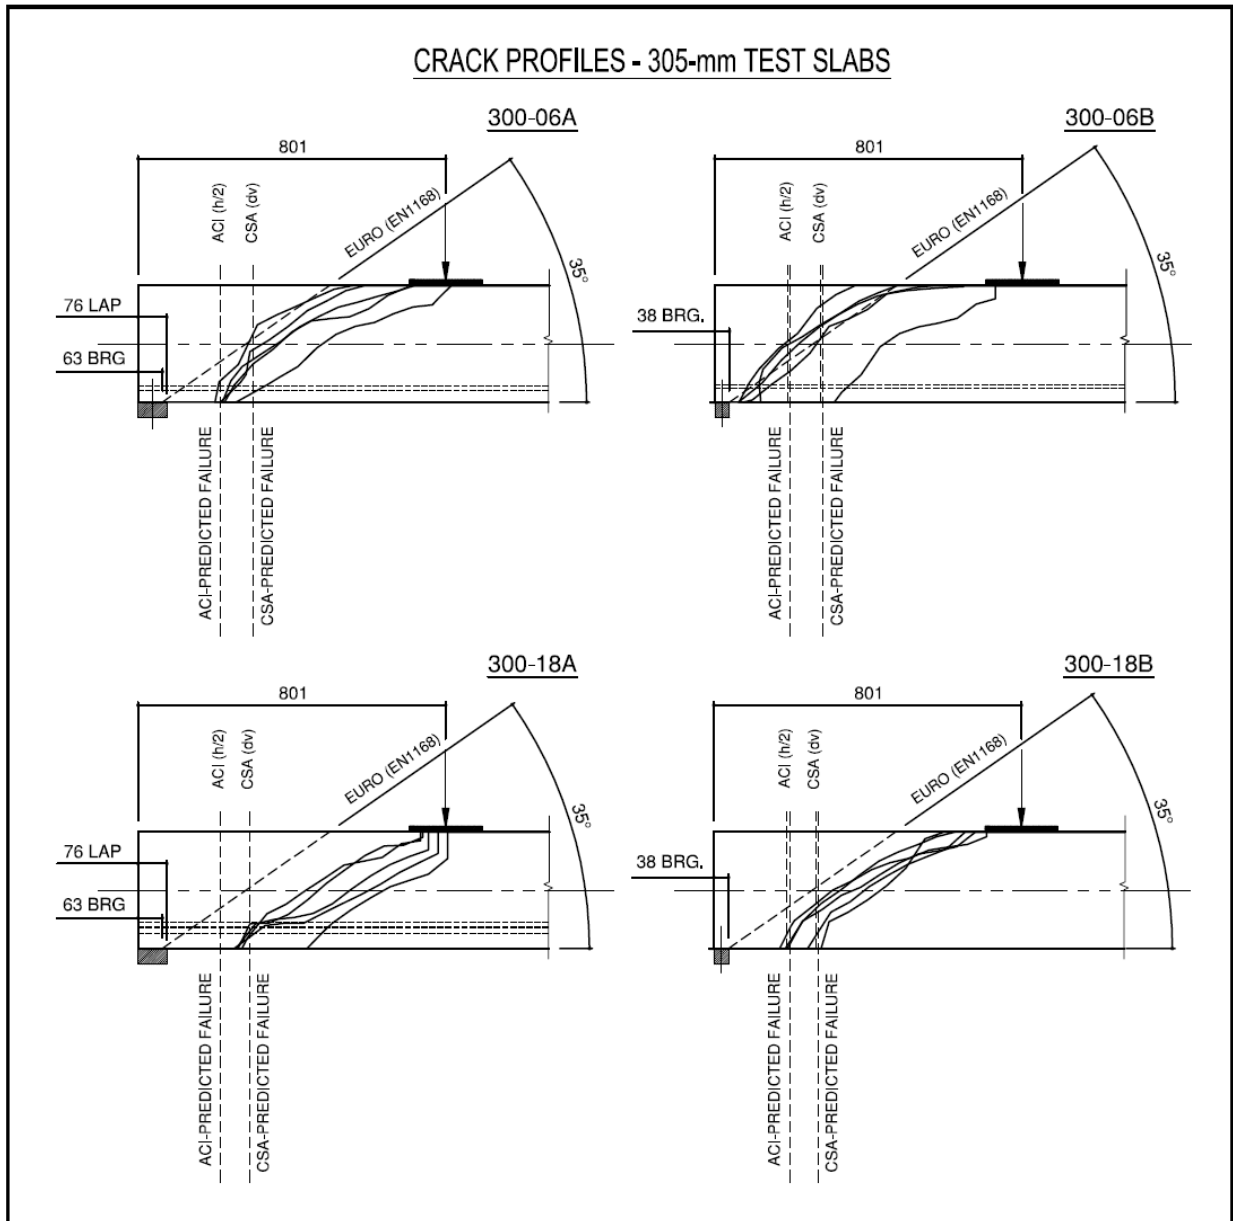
Crack Profiles and Predicted Locations of Shear Failure for CSA and ACI Codes – Series-300 Test Slabs
